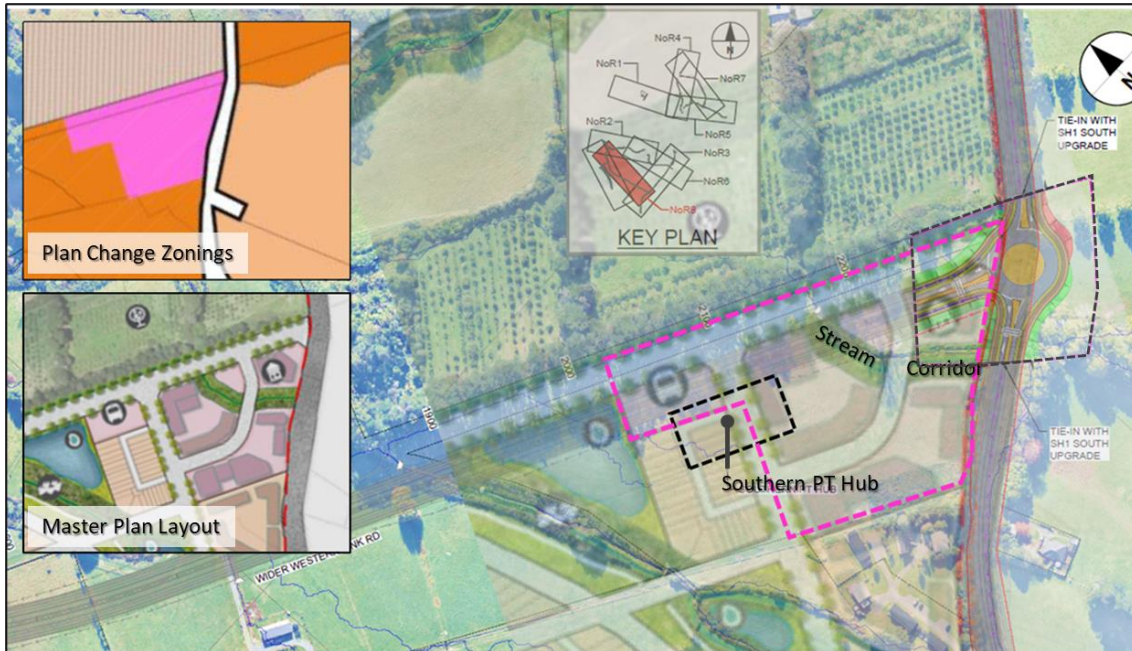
Illustrates the proposed local centre zone, master plans conceptual layout and the proposed designation.
